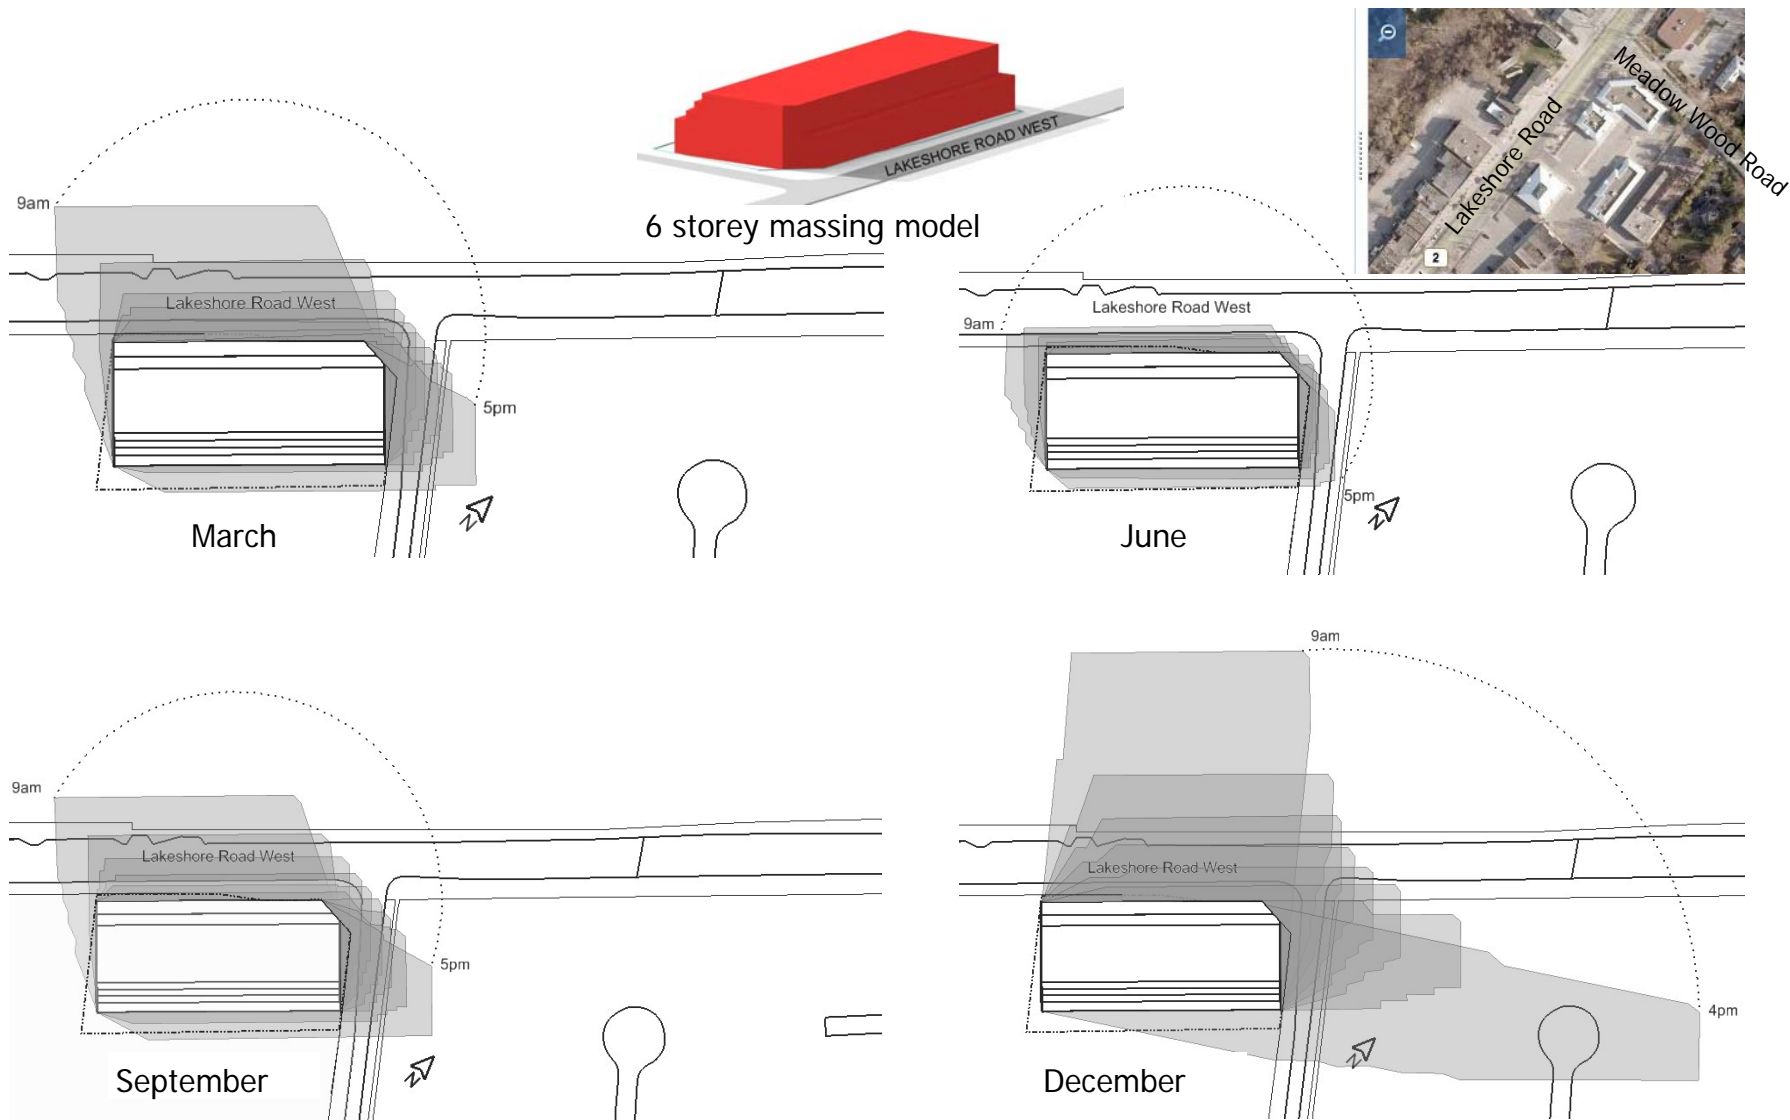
Shadow Impacts of a 6 storey building on the south side of Lakeshore Road West (1672 and 1679 Lakeshore Road West)
